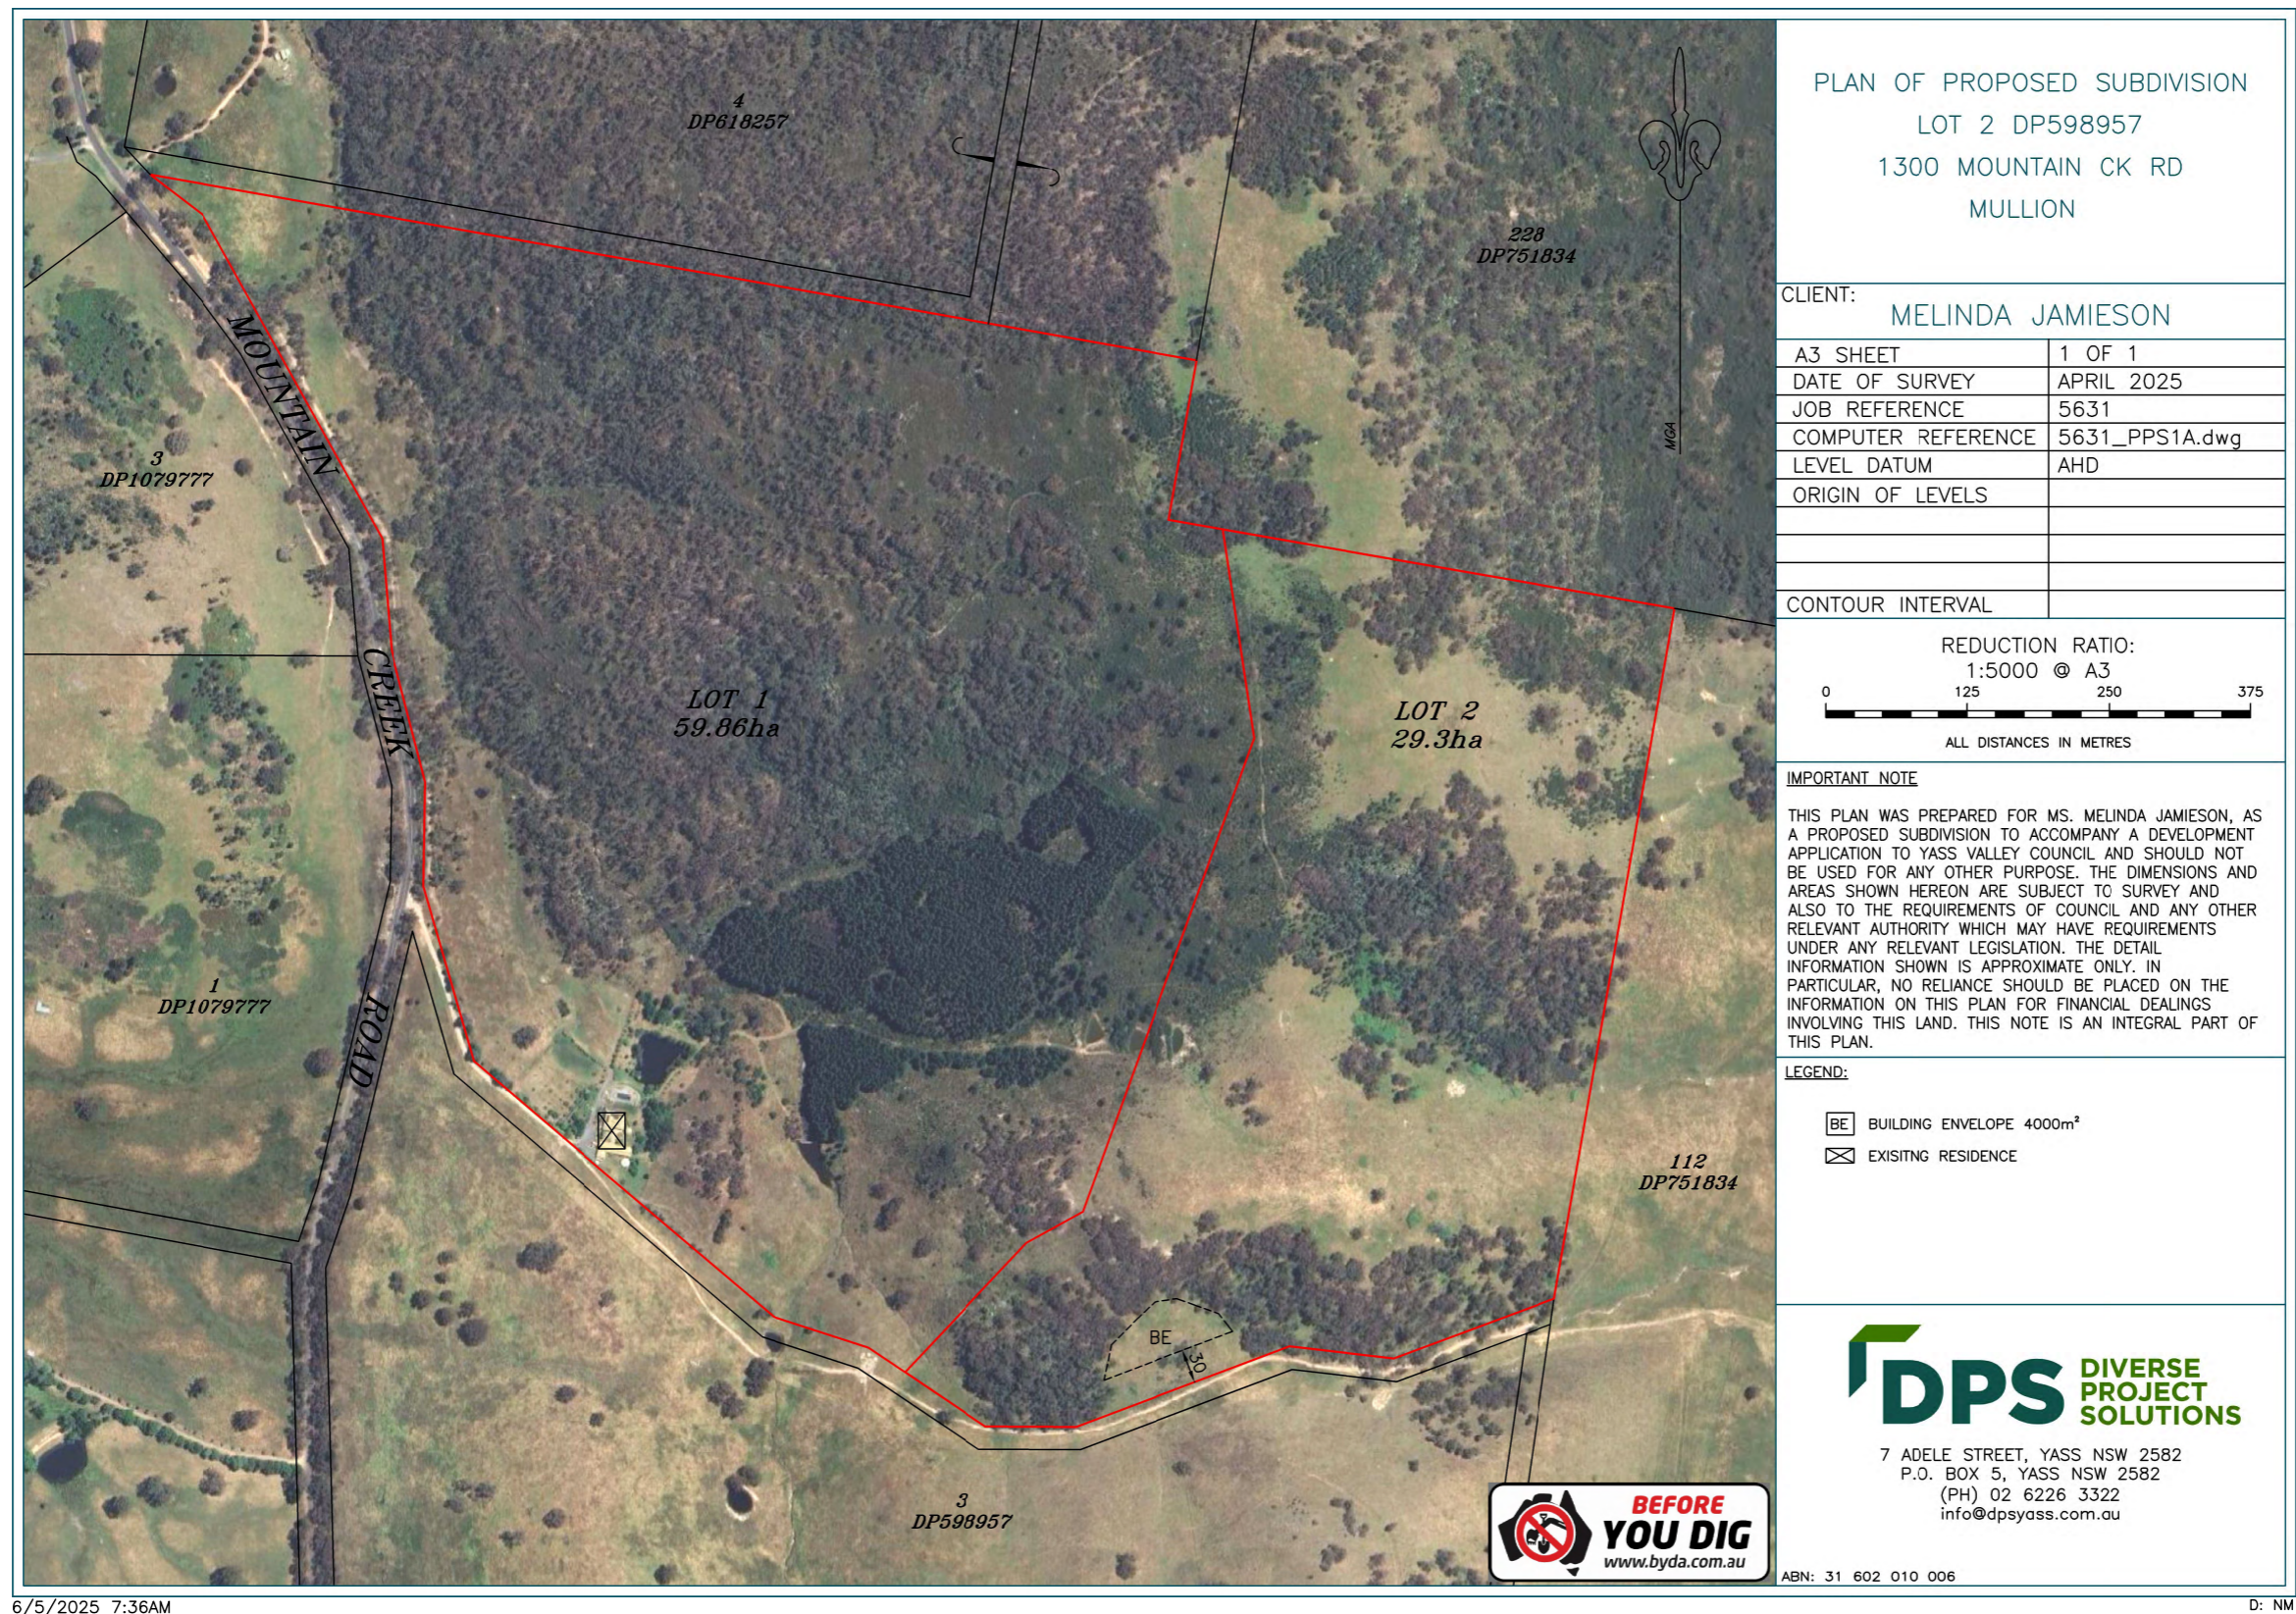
PLAN OF PROPOSED SUBDIVISION (DPS YASS, 2025)
